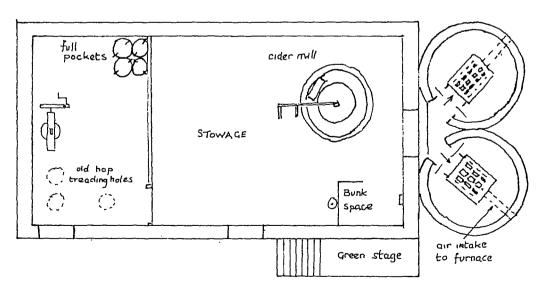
SITE LOCATION & GROUND FLOOR PLAN OF THE UPPER COURT BARN AND KILNS
